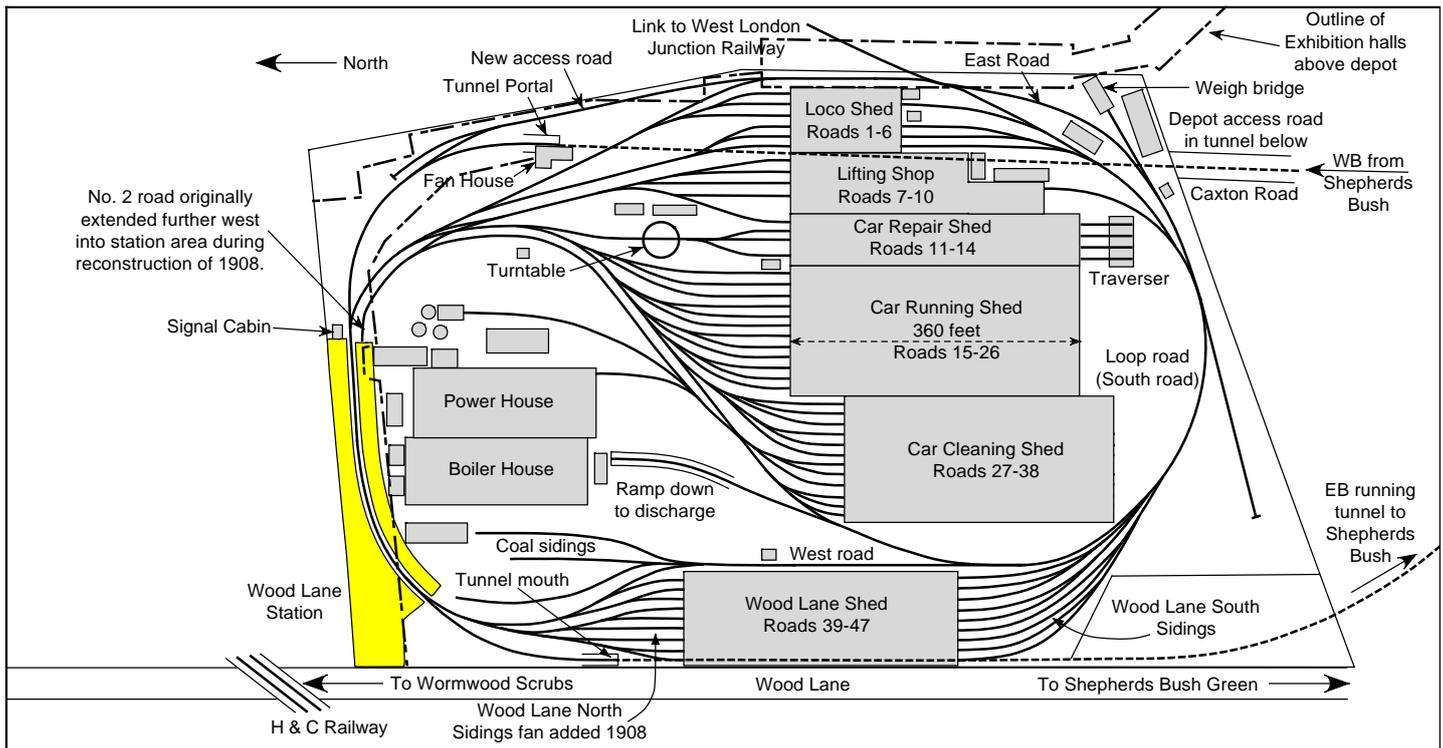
A plan showing Wood Lane depot in 1908 showing the new Wood Lane station and its connections to the Wood Lane Shed known as the Wood Lane North Sidings. Also shown is the connection between the station and the new tunnel mouth for the running line passing under the Wood Lane Shed and on to Shepherd's Bush. The outlines of the exhibition halls erected over the eastern and northern sides of the depot are included and, by this time, a fan house had been built over the original tunnel entrance to assist with the ventilation of the railway. A turntable was also provided on the road leading to the car repair shed and a new access road between the station and the eastern side of the depot loop was added. A new shunting neck called No.2 road was added to allow temporary access to the main sheds during the construction of the station. It was cut back to the position shown in this drawing when the station was completed. Drawing by author.
